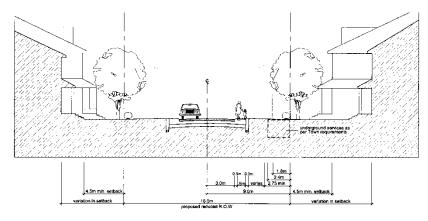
Proposed Rolled Curb Street Section. Note: This sketch is for illustrative purposes, and does not replace Town standards.
